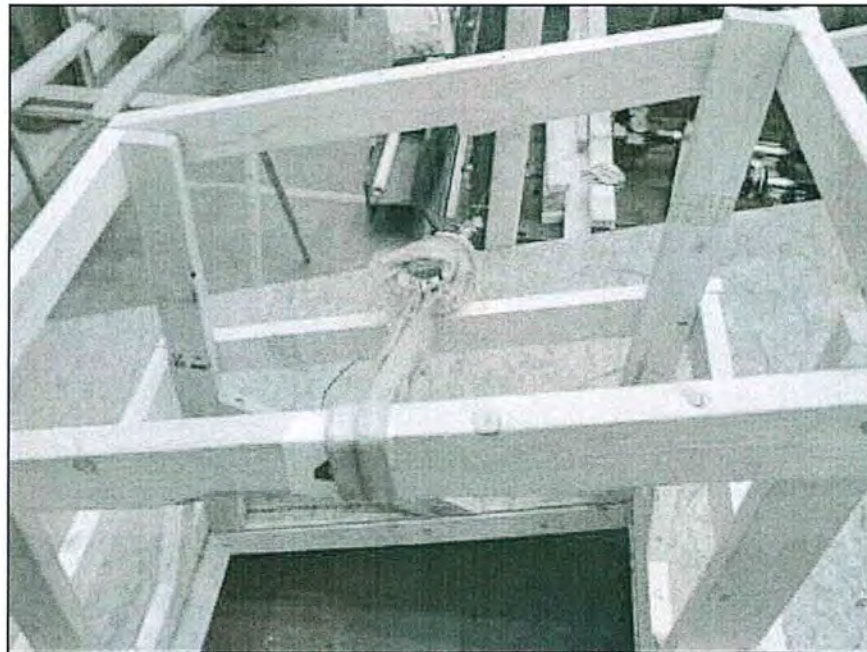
The force transducer is installed in-line with the pull-to-failure (PTF) hydraulic cylinder and the top rail of a Job Built guardrail system.
